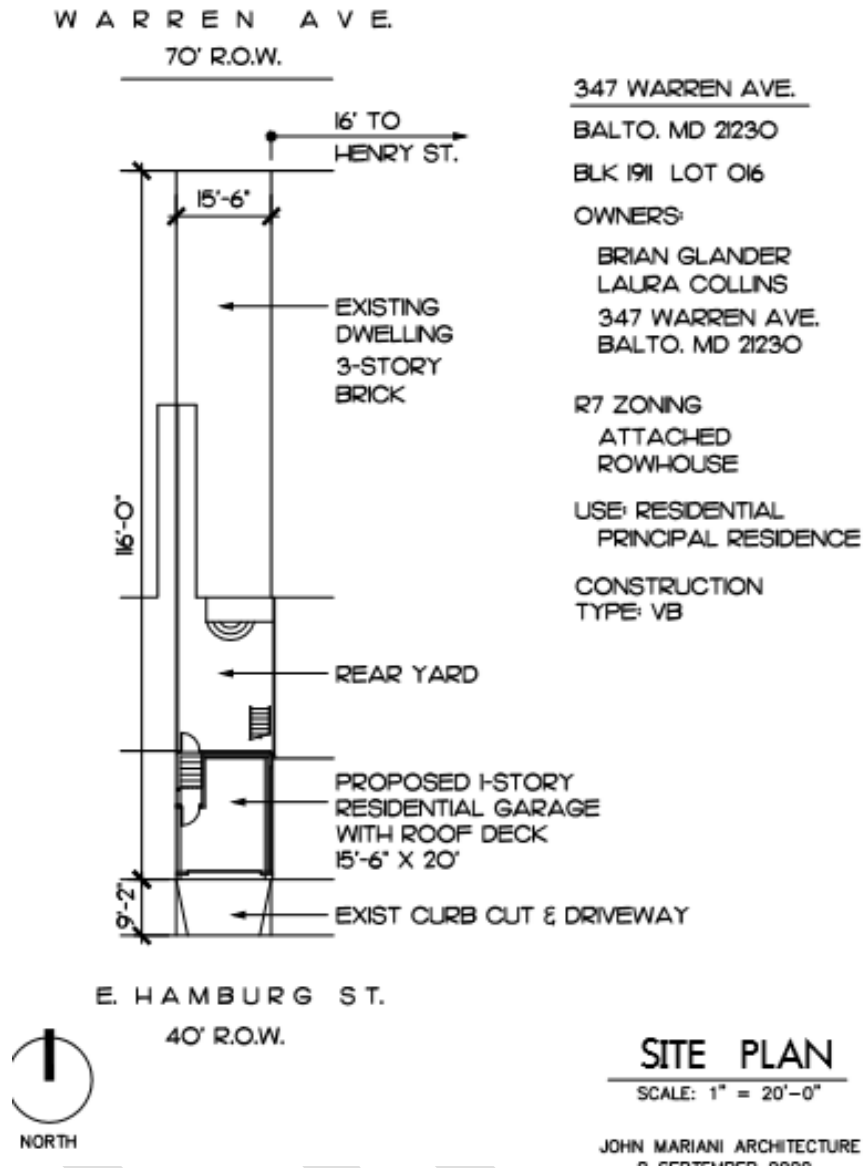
347 Warren Avenue – Proposed rear garage, site plan
